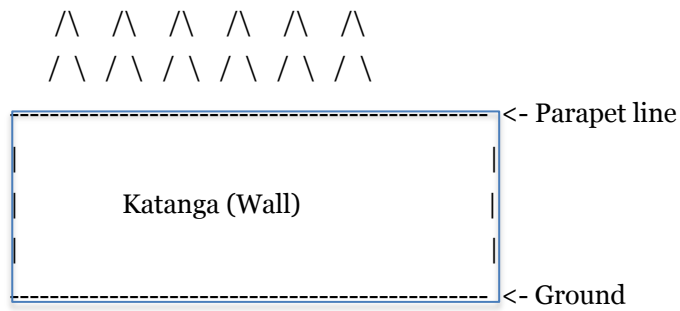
Hausa Traditional Architecture: Roof Pinnacles, Zankway (Elevation)
